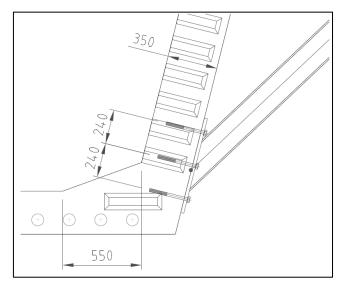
Strut-Girder connection (Section) (dimensions in mm)
